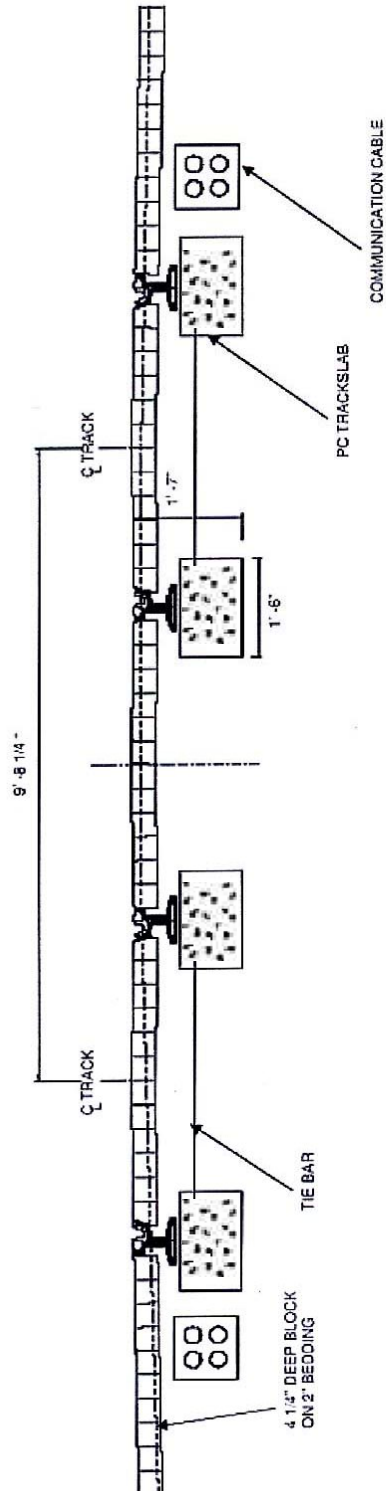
Section through Special Track Supports to Allow Manholes between Rails
